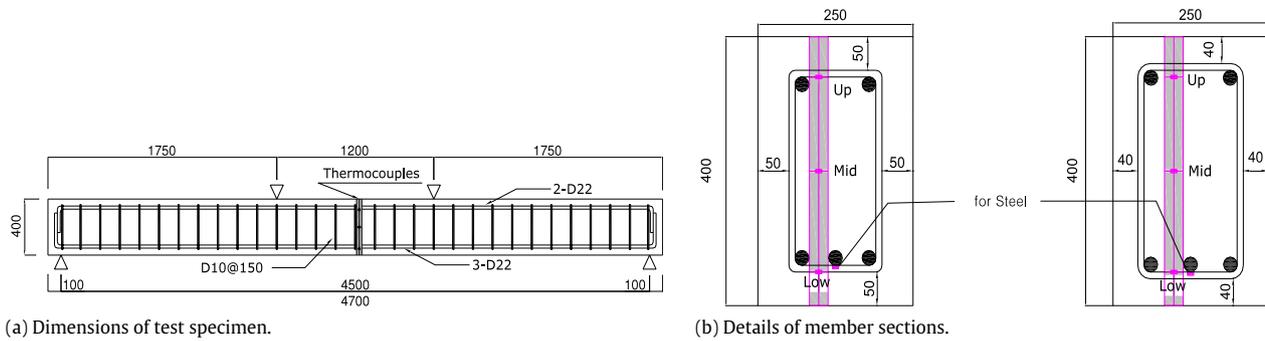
Configuration of fire test beam and location of thermocouples in the sections (unit: mm).
